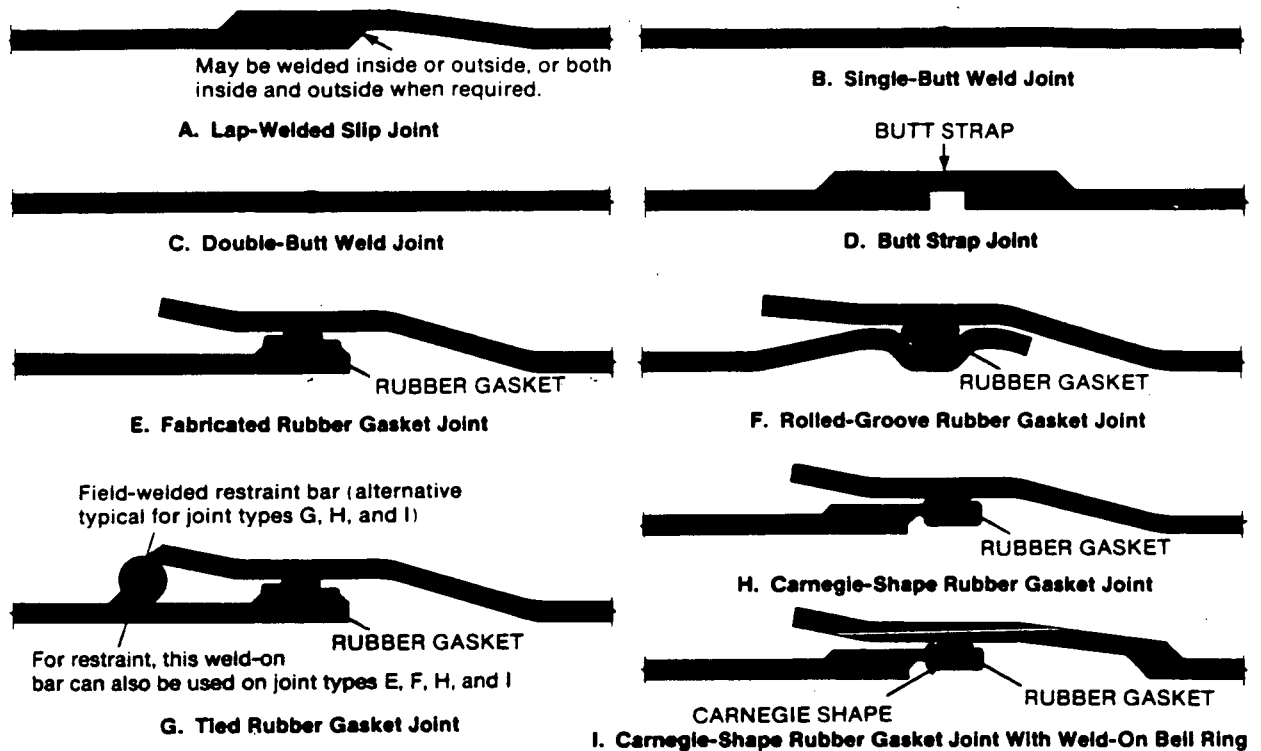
Welded and Rubber-Gasketed Field Joints
